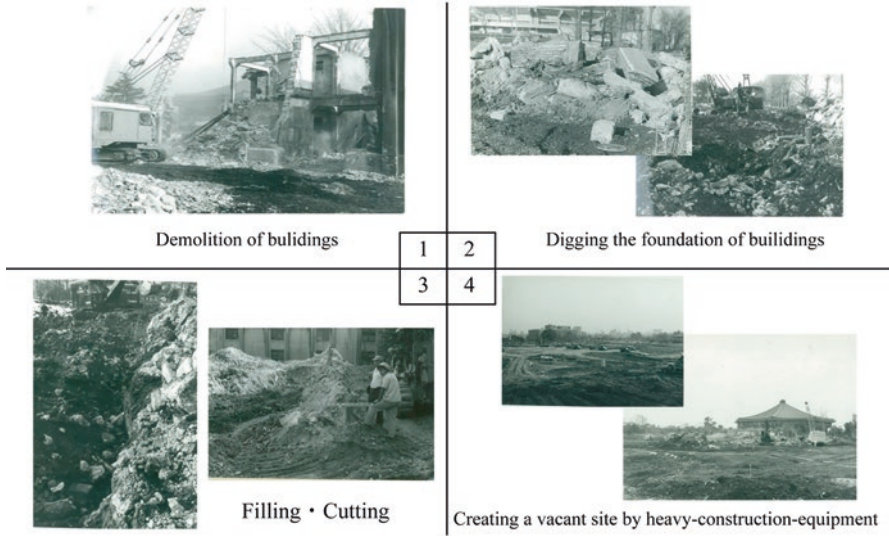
Procedure of land modification, 1961–1969. Land modifications were performed using the following procedure (1) demolition of buildings, (2) building foundation excavation, (3) filling and cutting, (4) ground smoothing by heavy construction equipment
